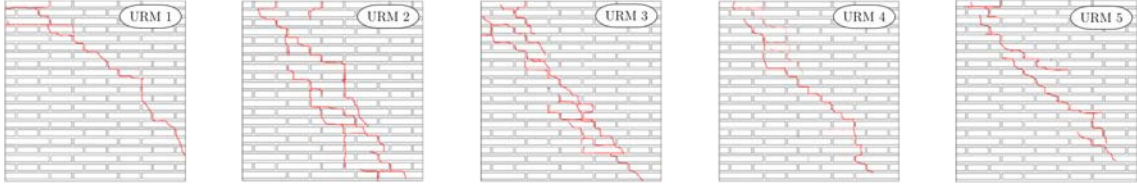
Crack patterns of the unreinforced masonry walls after having performed the diagonal compression experiments ([Garcia-Ramonda et al. \(2020\)](#) and [Segura et al. \(2021\)](#))
